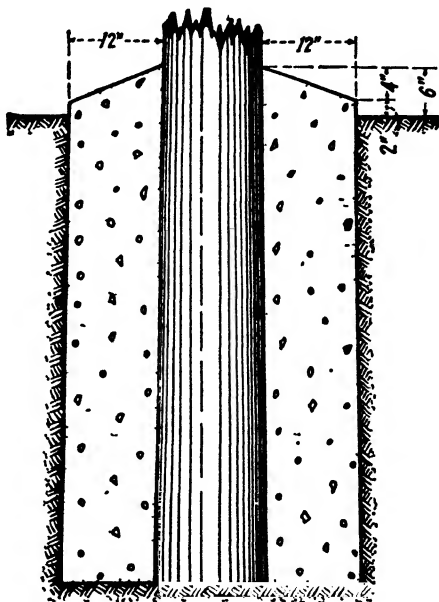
Concrete foundation for wooden pole. The mixture should be made thin enough so that it will not require tamping. (Courtesy Texas Power & Light Co.)
